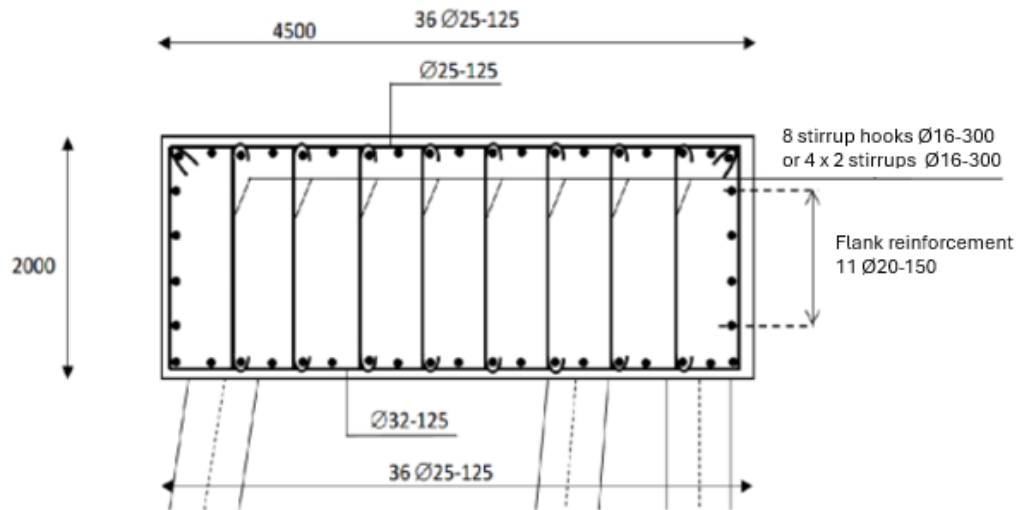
Cross section of the concrete pile cap at middle pillars in new situation of the case study project
